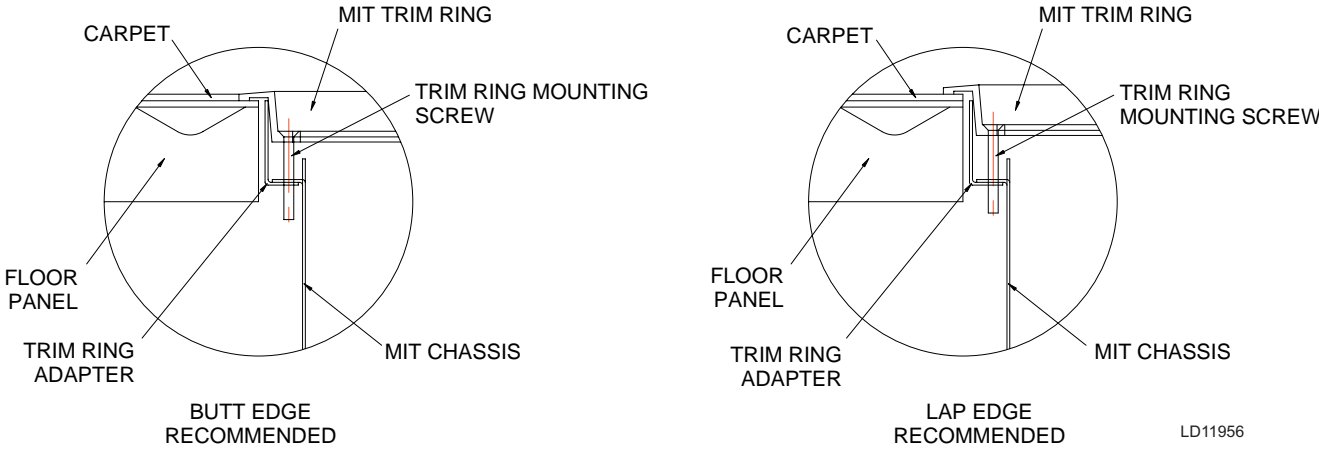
FLOOR PANEL OPENING FOR 5 X 10 GRILLES
